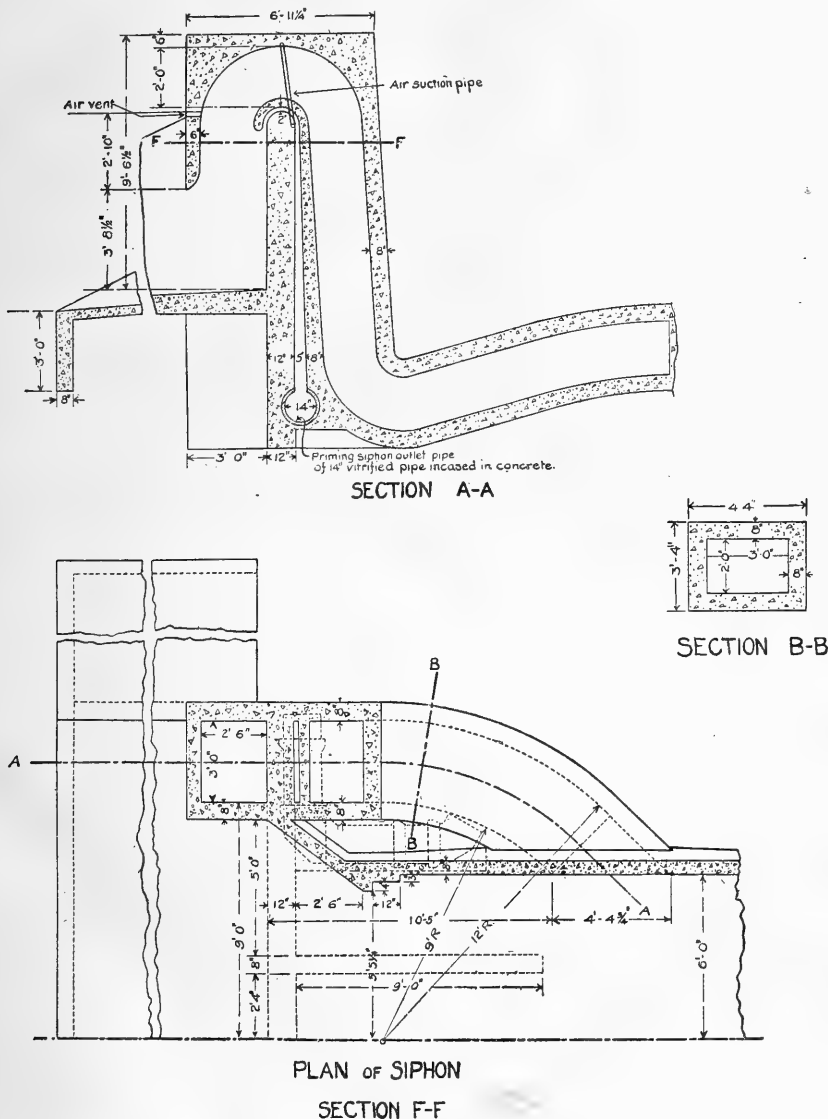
Cross-section and section plan of siphon spillway. South San Joaquin irrigation district, Ripon, Calif.
